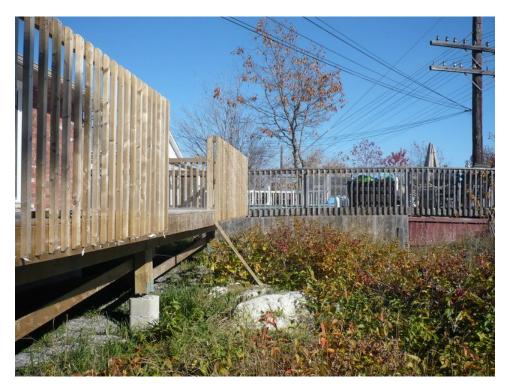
953 HOWEY DRIVE, SUDBURY – VIEW OF REAR DECK FACING SWIMMING POOL ON PROPERTY ABUTTING EAST
